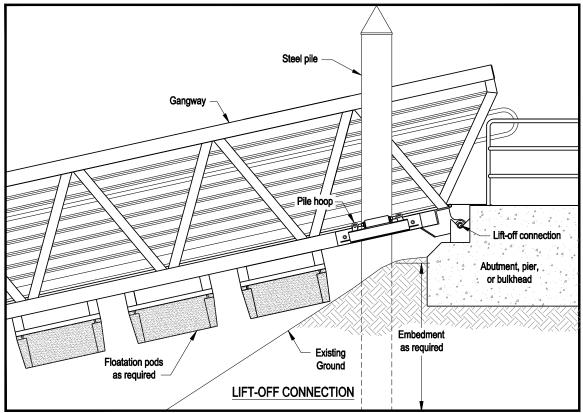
Required lift-off connection when water levels may exceed connection point elevation
